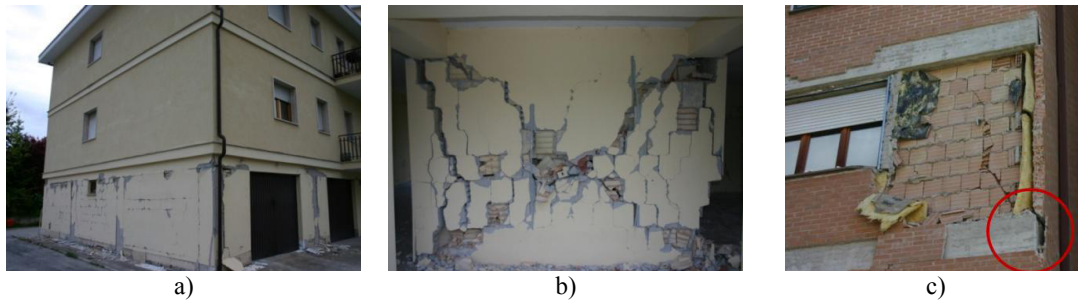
IM walls in-plane damages reported in recent earthquakes a) Detachment of the surrounding RC frame b) Diagonal cracking and corner crushing and c) diagonal cracking.
